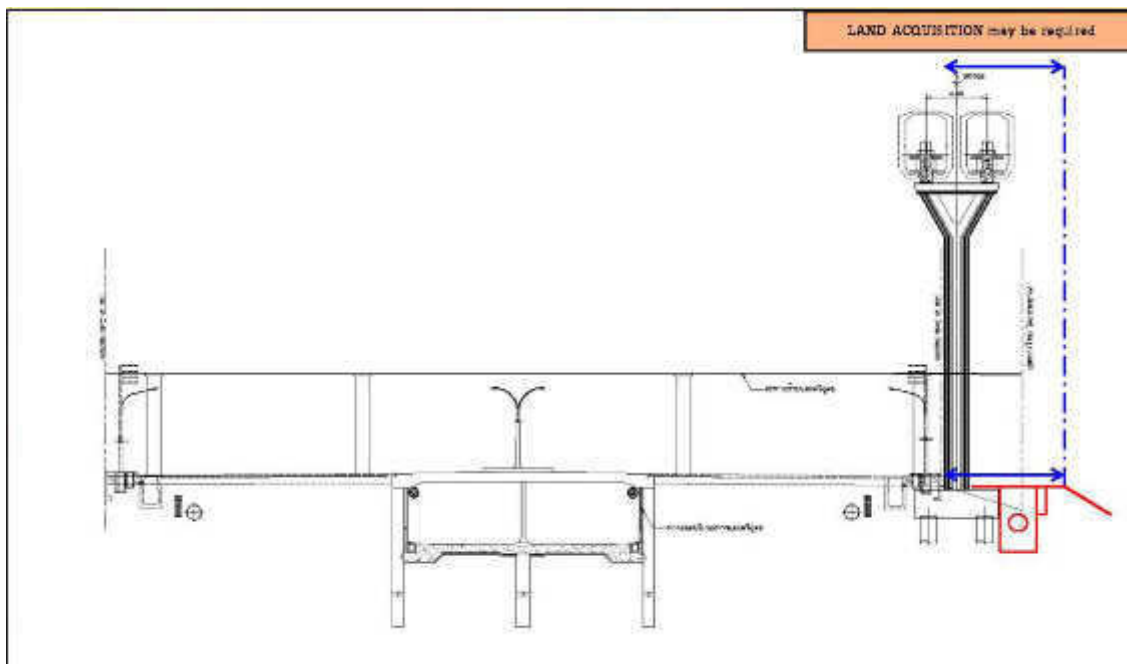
10 Cross section of road from Si Udom Intersection to Si lam Interchange,
